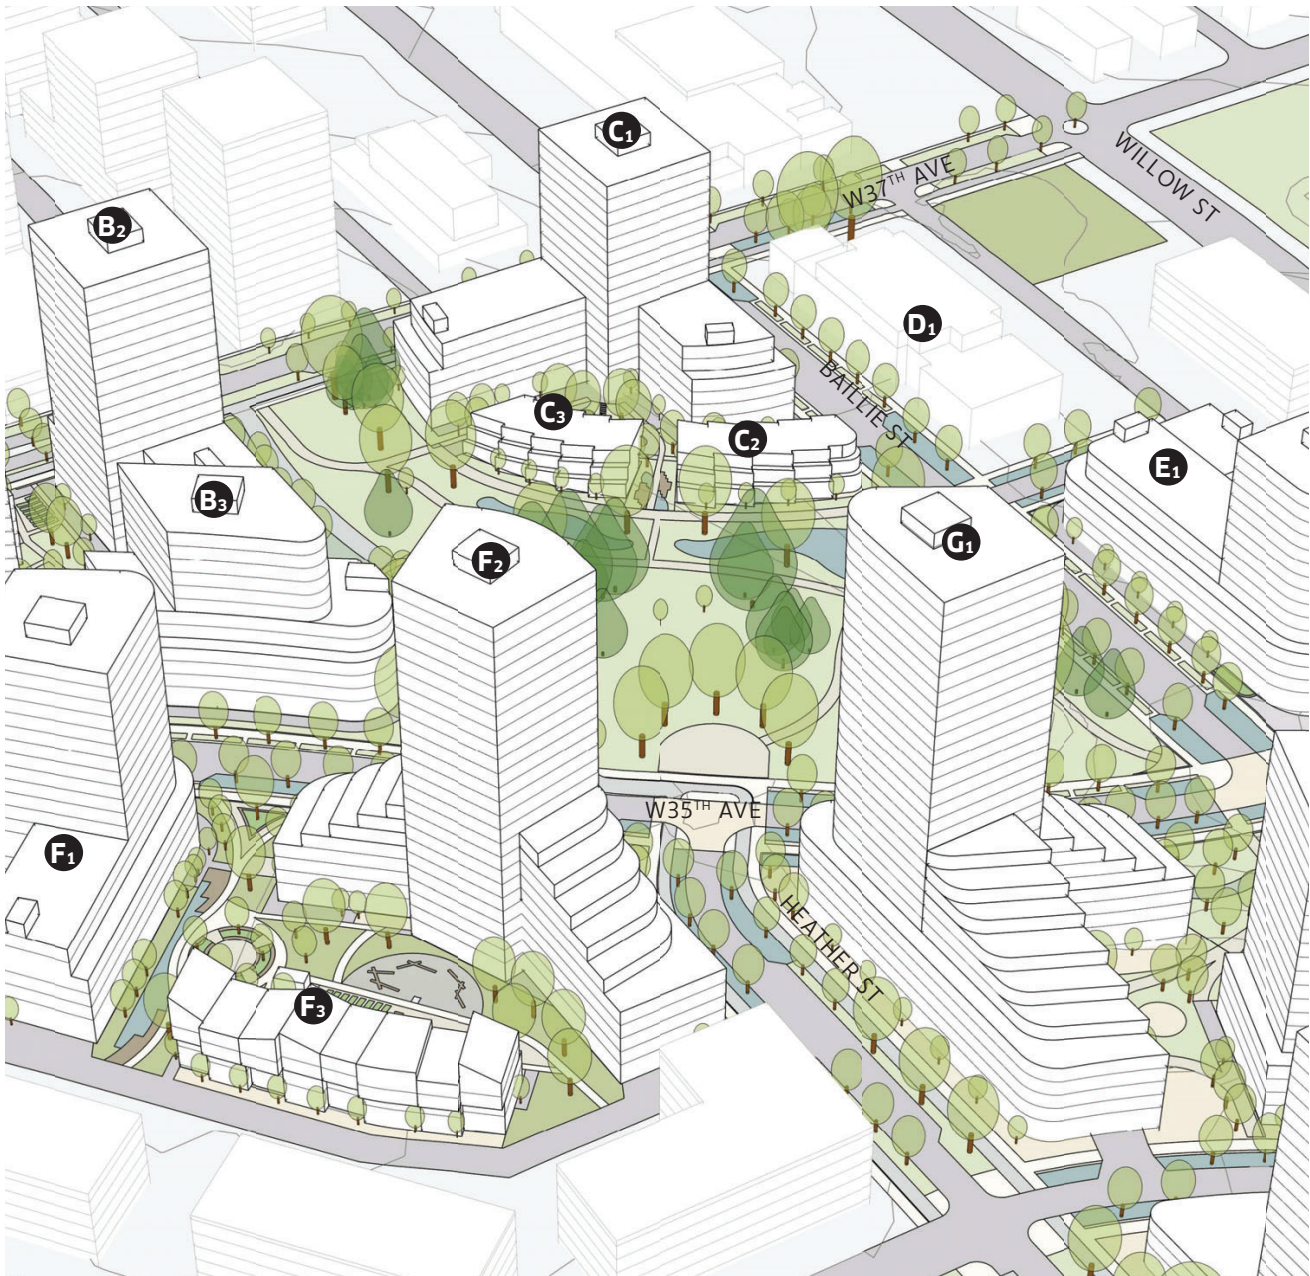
Aerial View, Buildings F2 and G1, Parcel F and C Townhomes Looking SW
